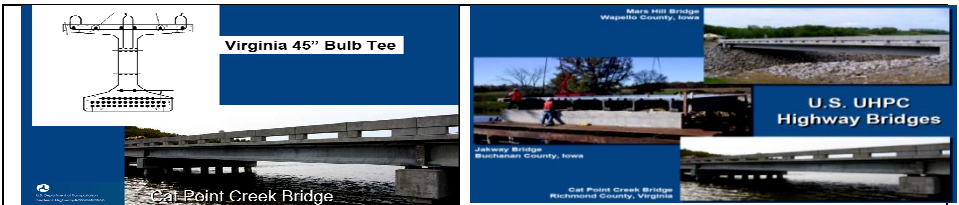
Bridges used UHSC to cast T and I beams in America
